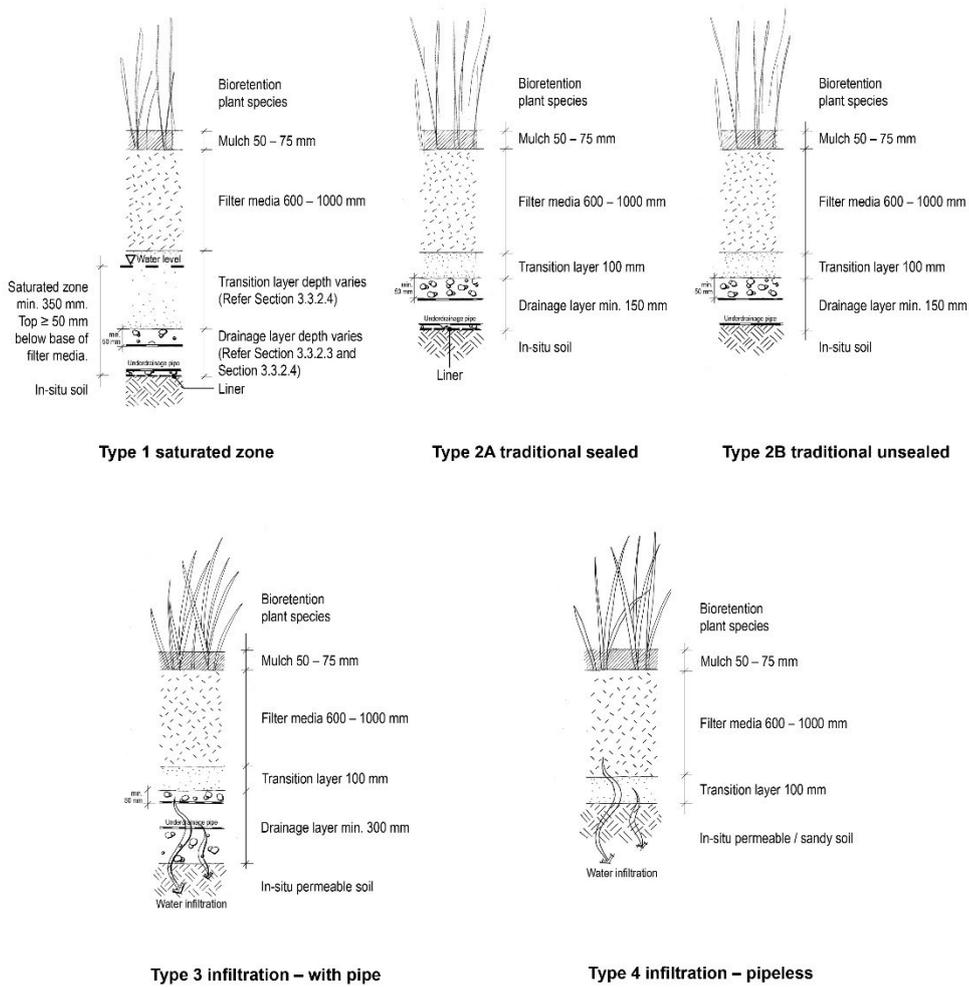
Cross-section of a typical bioretention system with a saturated zone.
